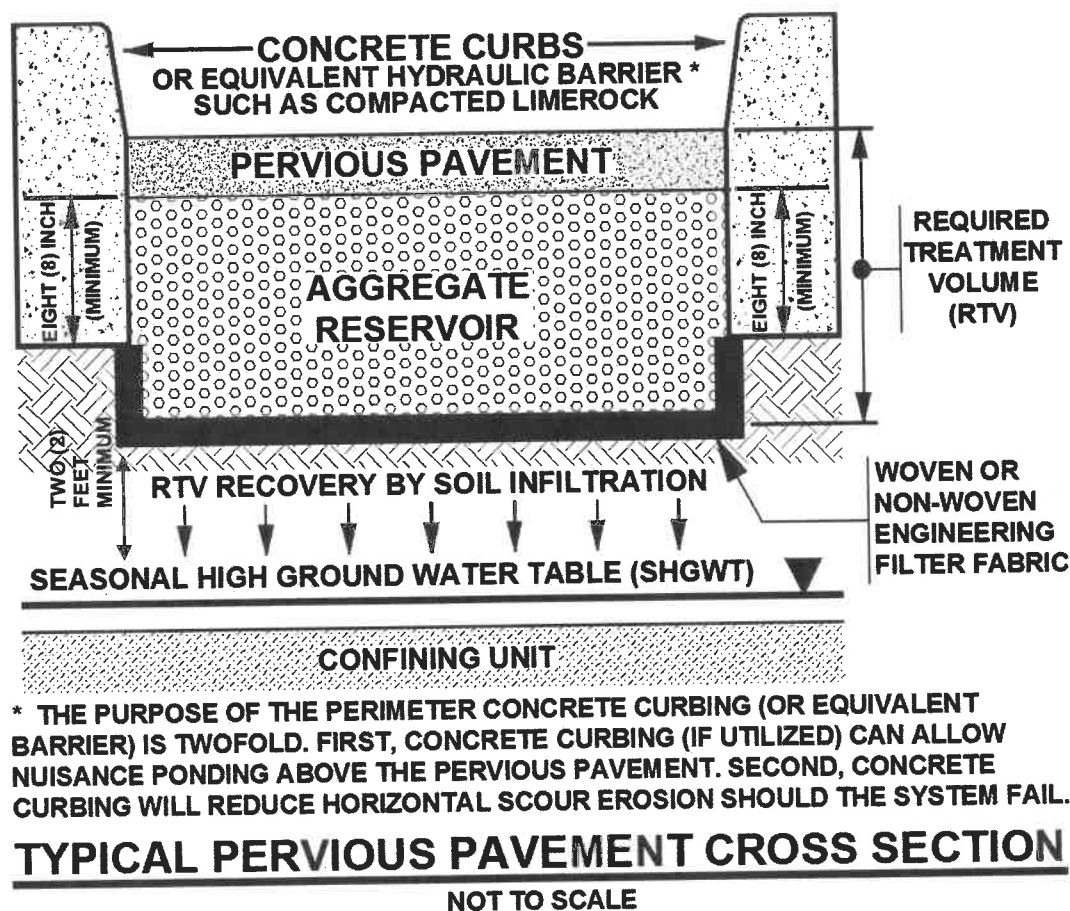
Typical Pervious Pavement Cross Section
